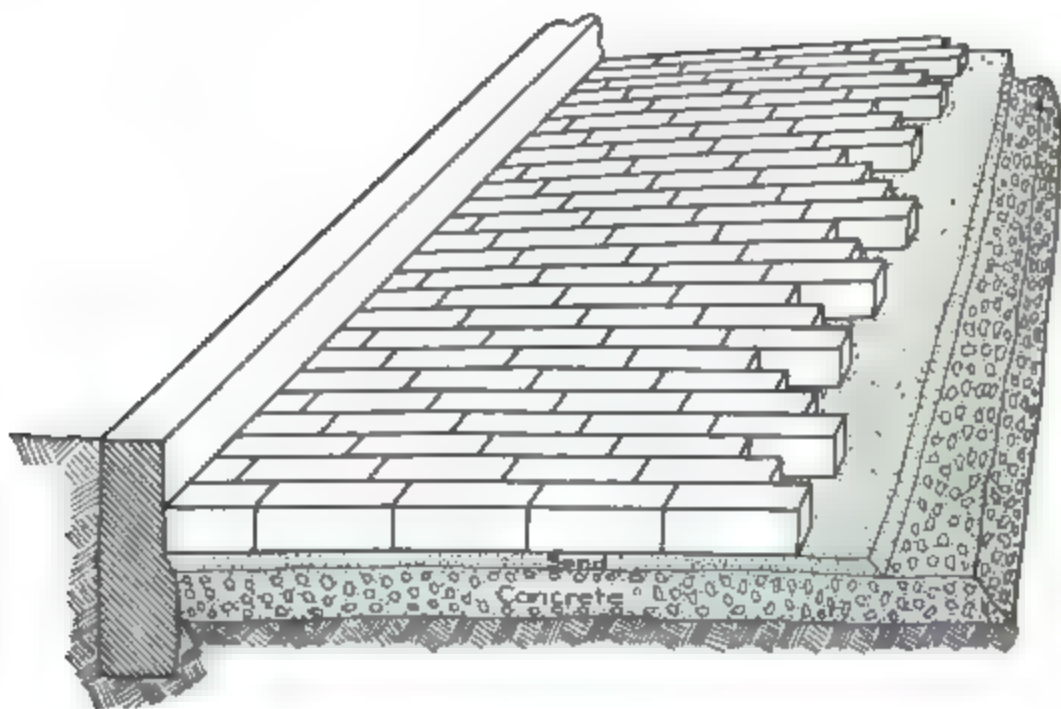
SECTION OF BRICK PAVEMENT WITH CONCRETE FOUNDATION.
